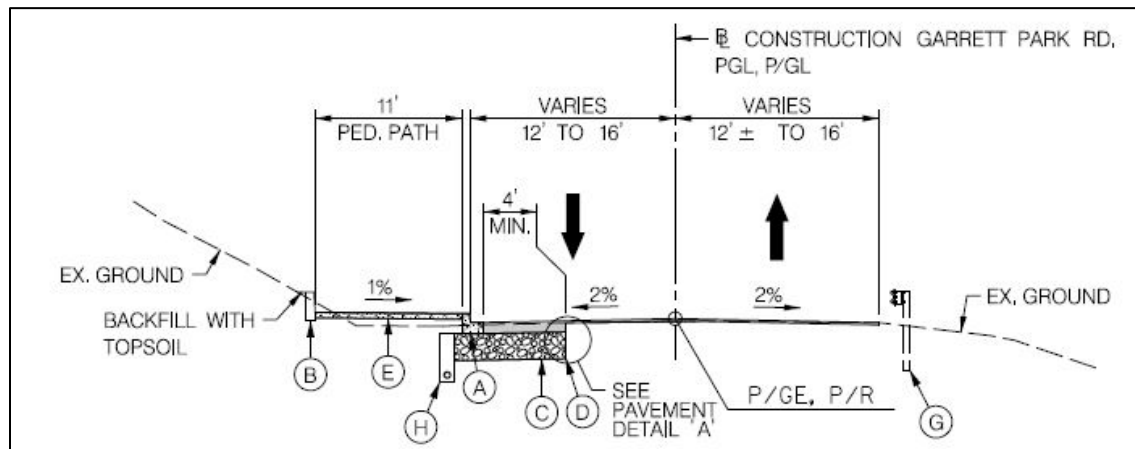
Proposed Typical Cross Section Design – Stations 11+58 to 12+77
